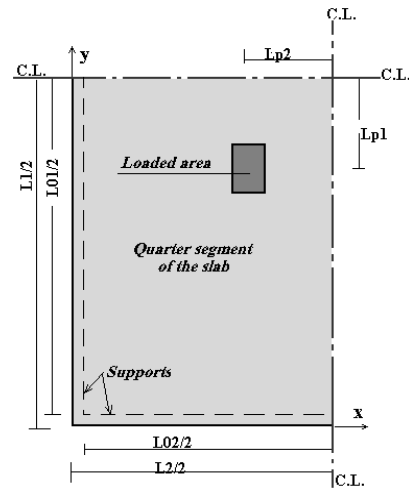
Slab dimensions, loading positions and supported edges [8].
